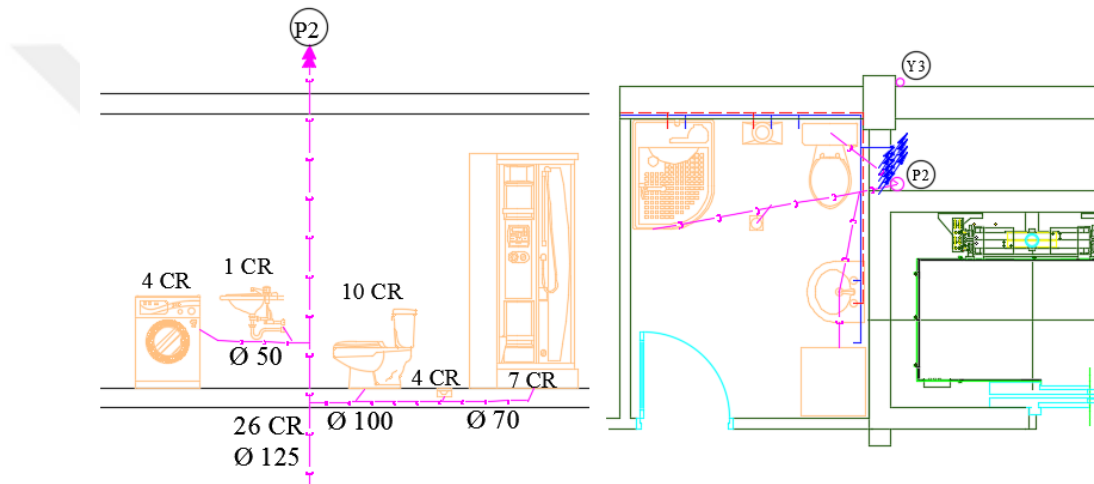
Wastewater piping diagram and plan in the bathroom
